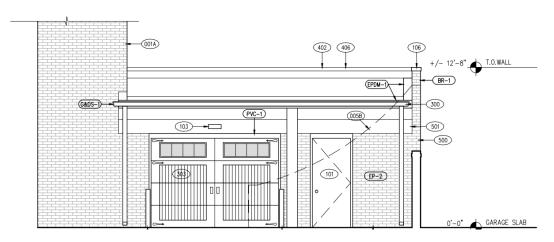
Proposed east elevation showing the design of the pedestrian and vehicular doors, bollards, and lighting.
